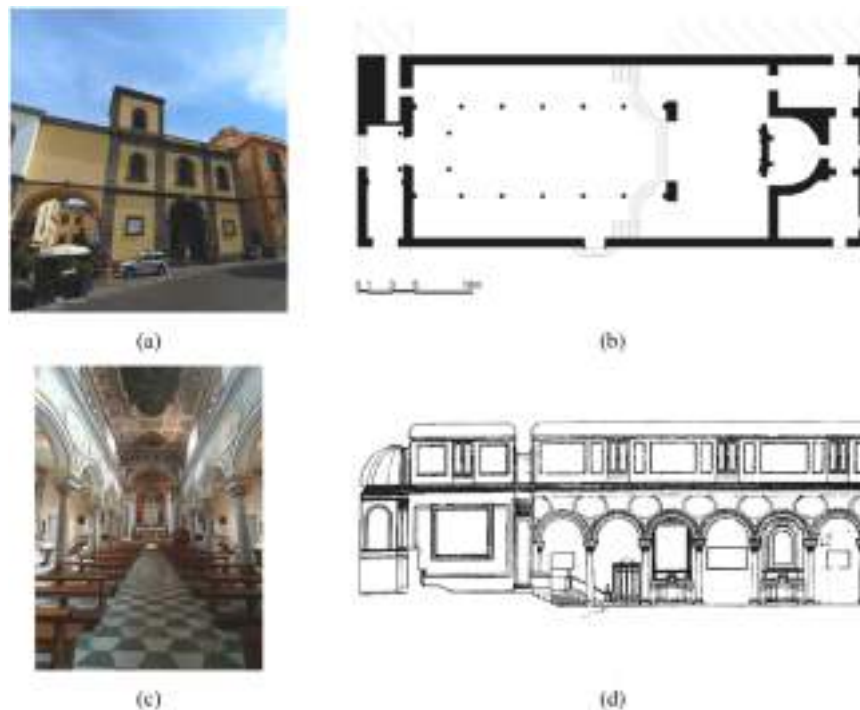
Photographic documentation of the church of *Saint Antonino*: a) Main façade; b) Ground floor layout; c) Nave, d) Cross-Section.
